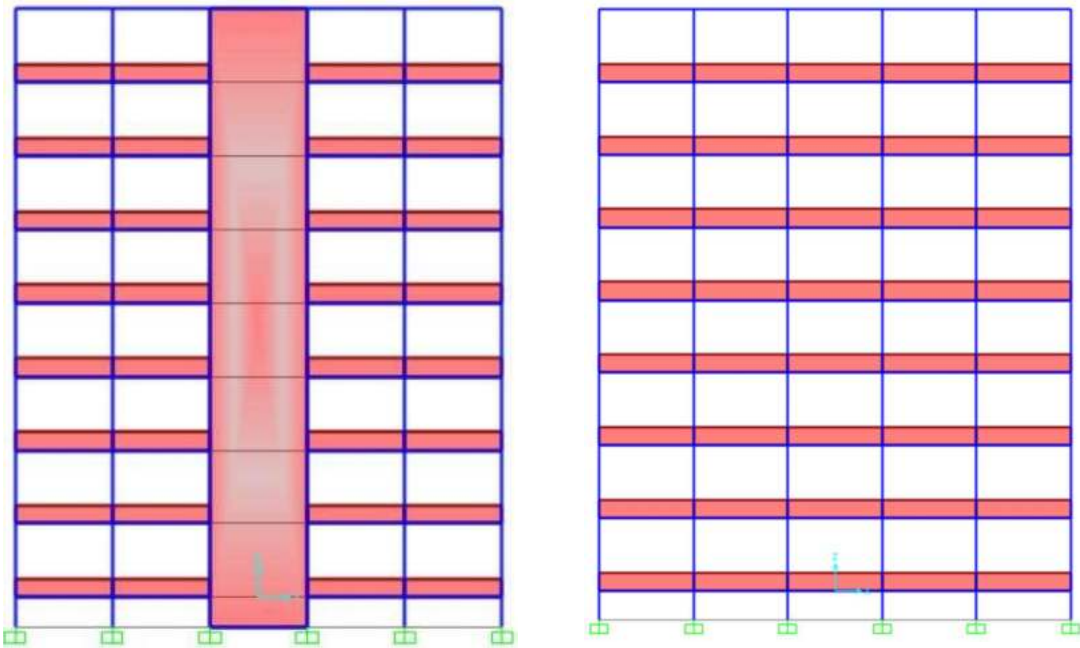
Elevation of 25% Partially in-filled frame with shear wall
